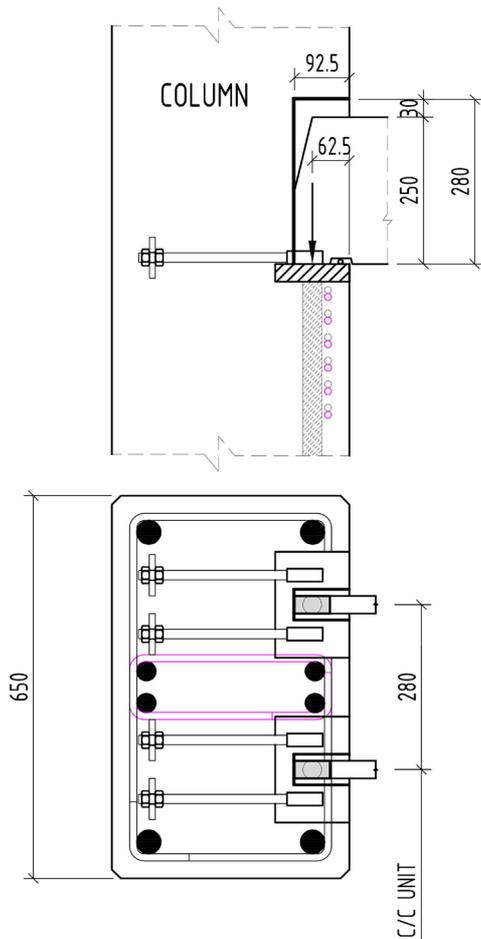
BSF450 column unit. (Reinforcement are not illustrated complete.)
